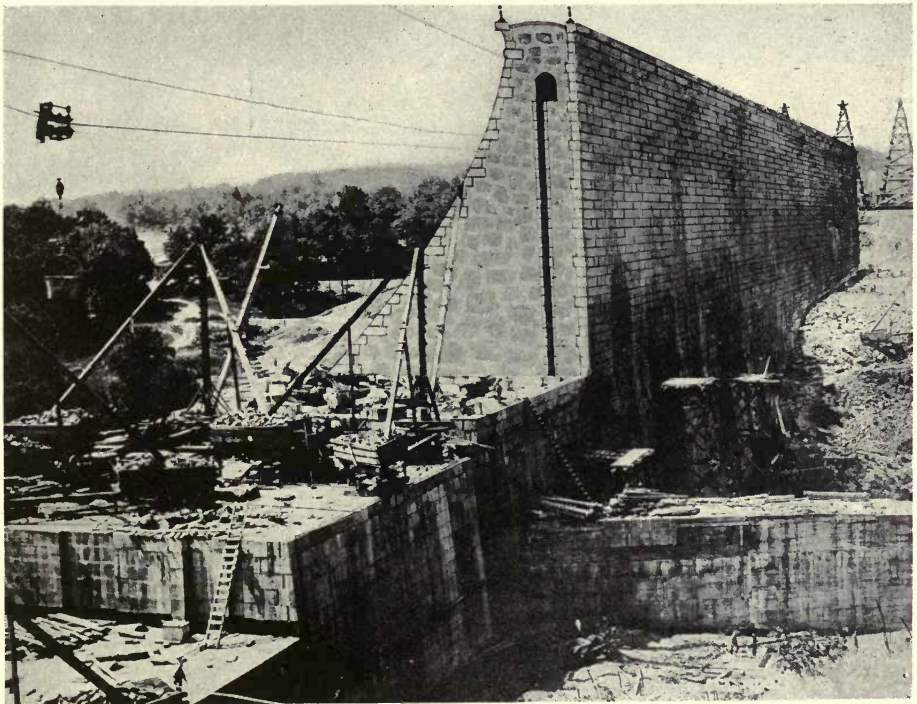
ASHOKAN DAM UNDER CONSTRUCTION
